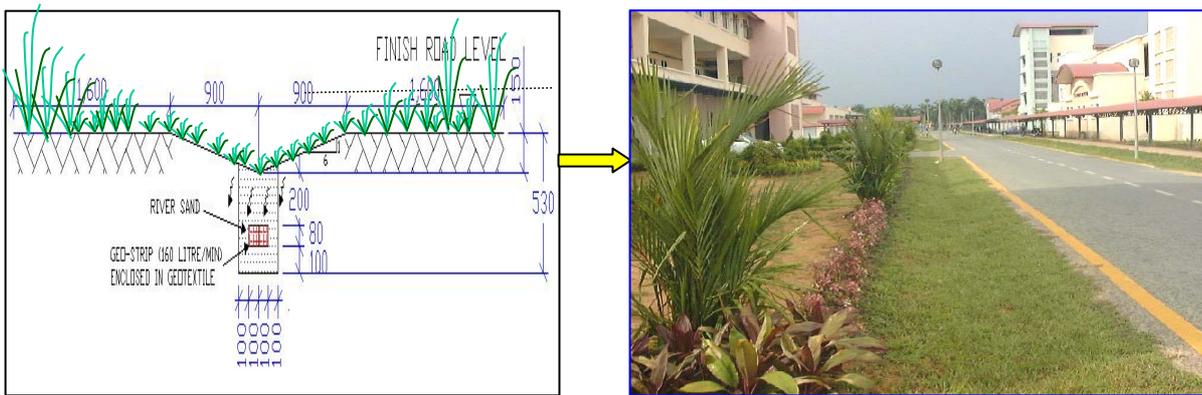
Perimeter swale cross section and the completed perimeter swale blended with the landscaping
